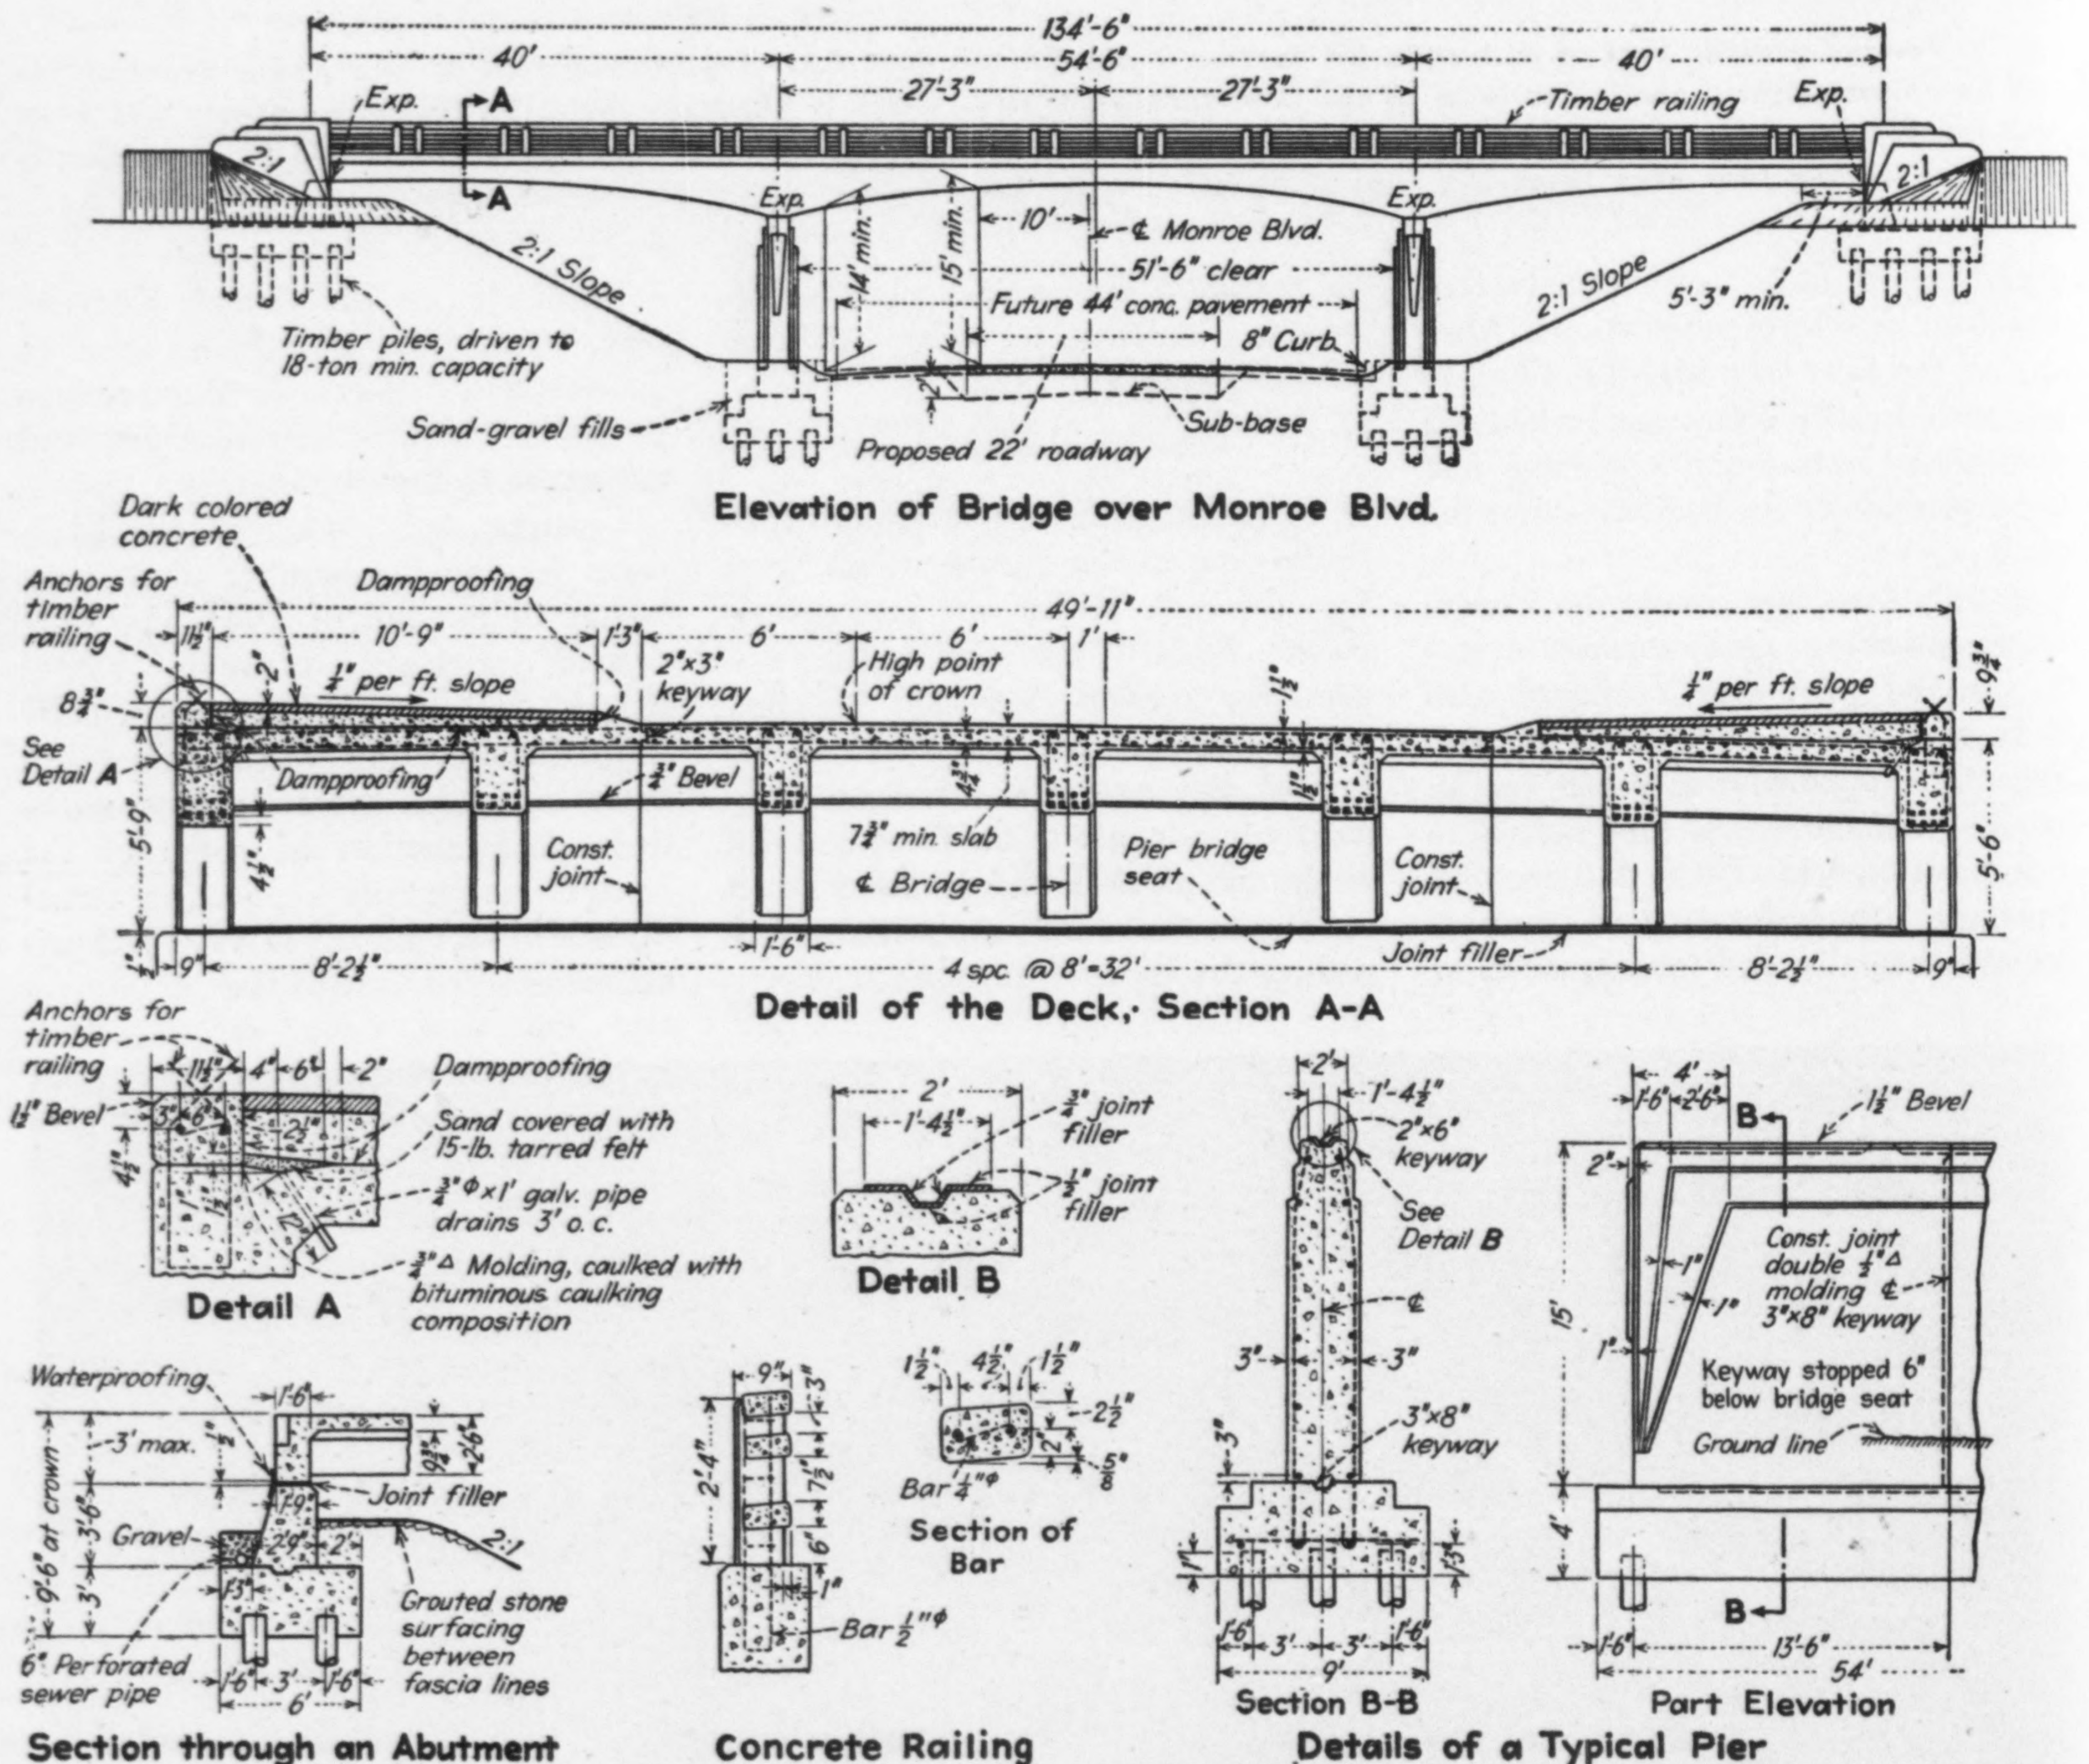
Superstructures at the grade separations are very similar. Foundations vary due to varying soil conditions. Girders are of reinforced concrete, except in the three-level structures and the Michigan Central crossing. Reinforced concrete is used in piers and abutments. Railing for structures are of reinforced concrete. Notable is inclusion of the full shoulder width in the bridge decks. Concrete on the shoulder extensions is given a dark color.
